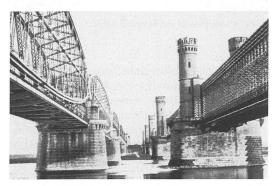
Second railway bridge at Tczew (left) together with the old one (right)
